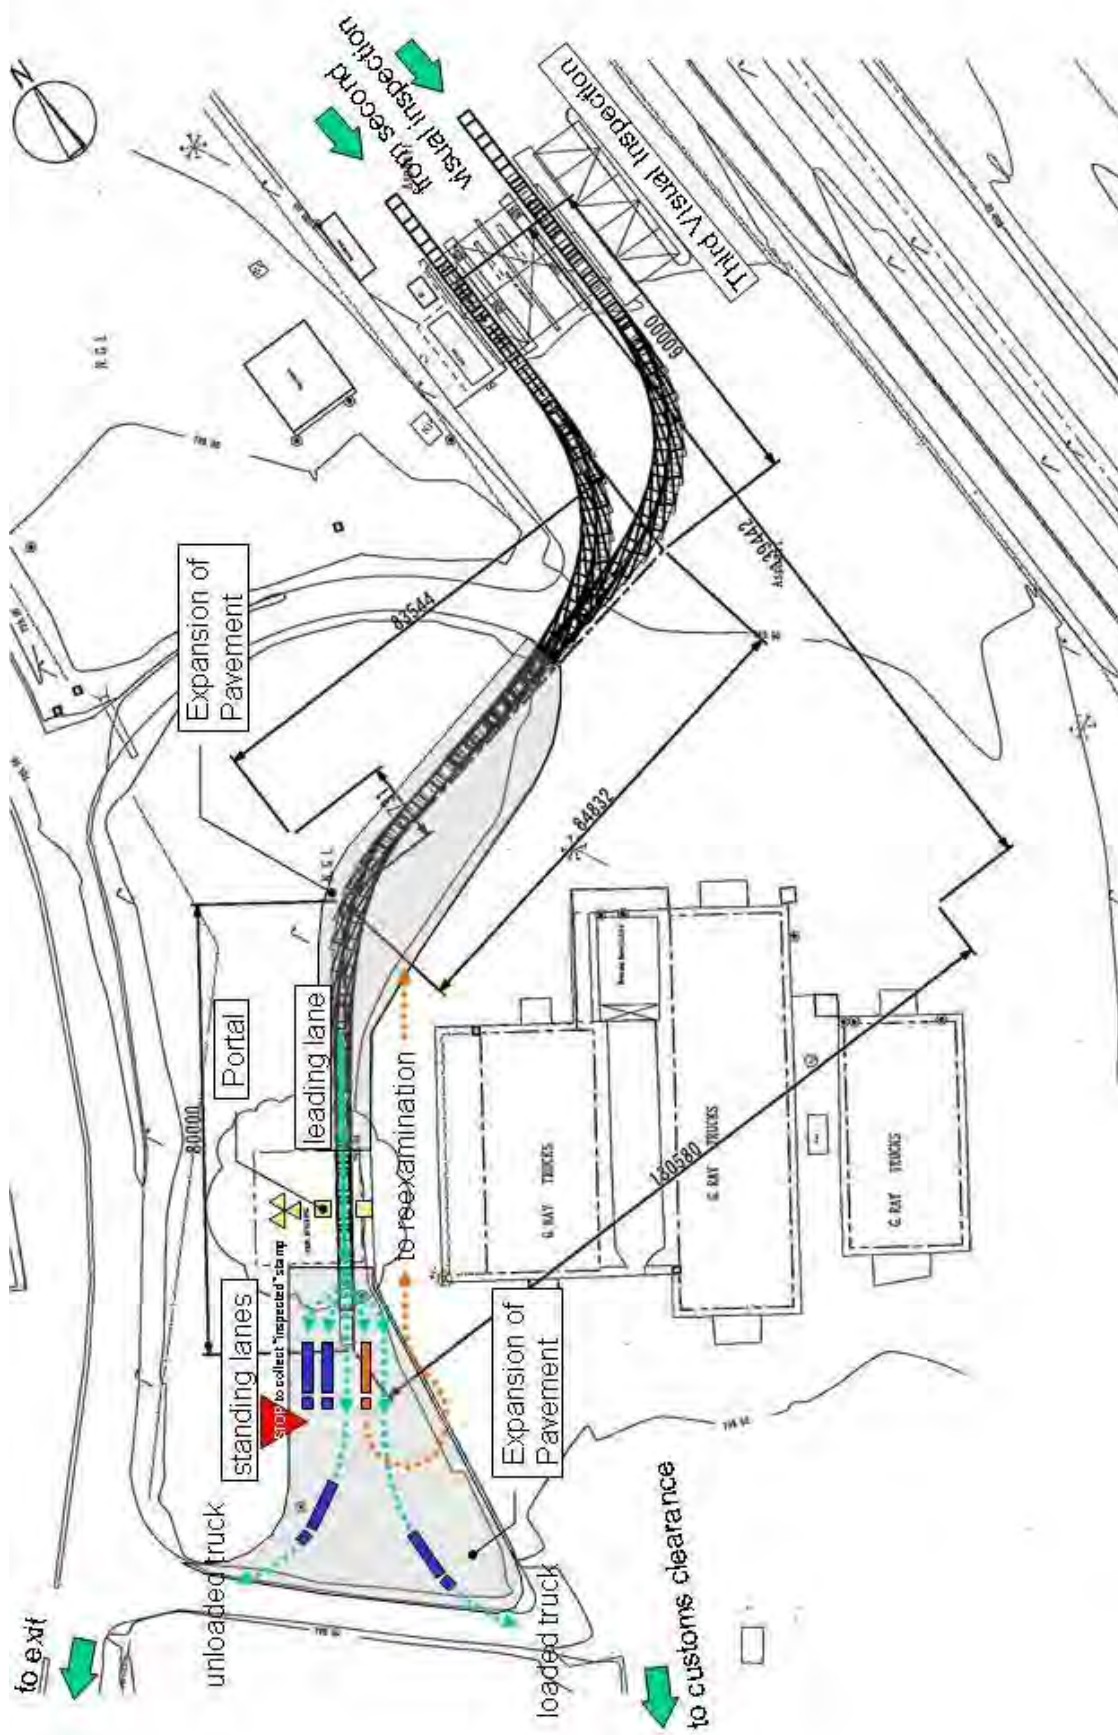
Facility Layout for X-ray Inspection Machine for Cargoes and Oil Tankers
